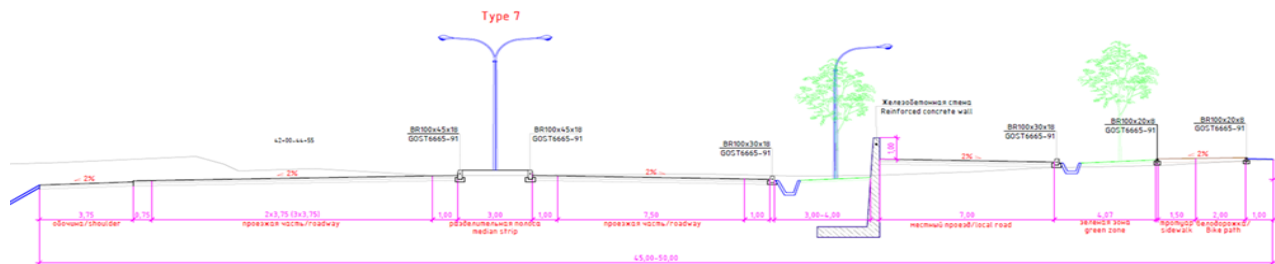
Typical cross section in settlement area with local road (4 lanes plus local road)
